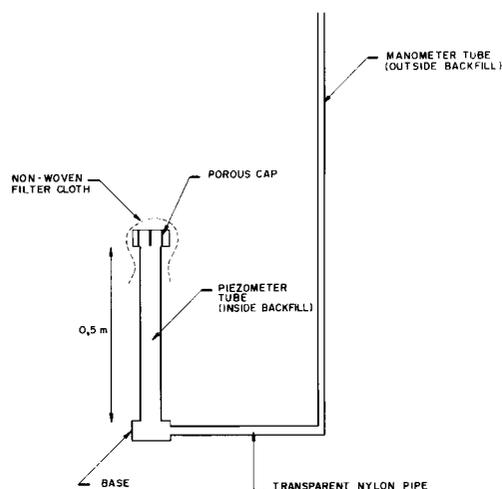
Standpipe piezometer for the measurement of pore pressures inside a backfill paddock
